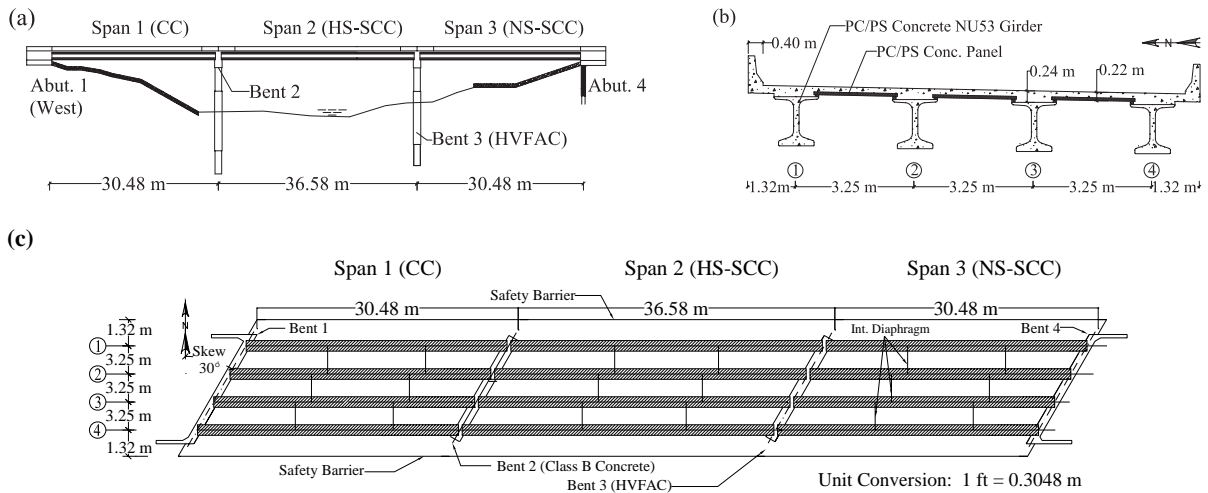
Bridge A7957. (a) Elevation. (b) Cross-section. (c) Plan view
